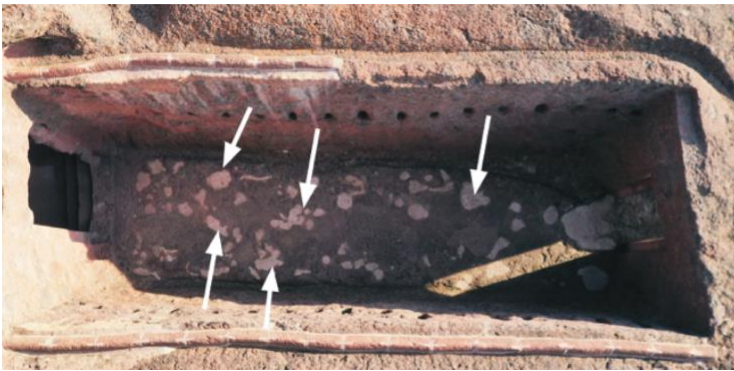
Biete Abba Libanos – Cracks on the floor
